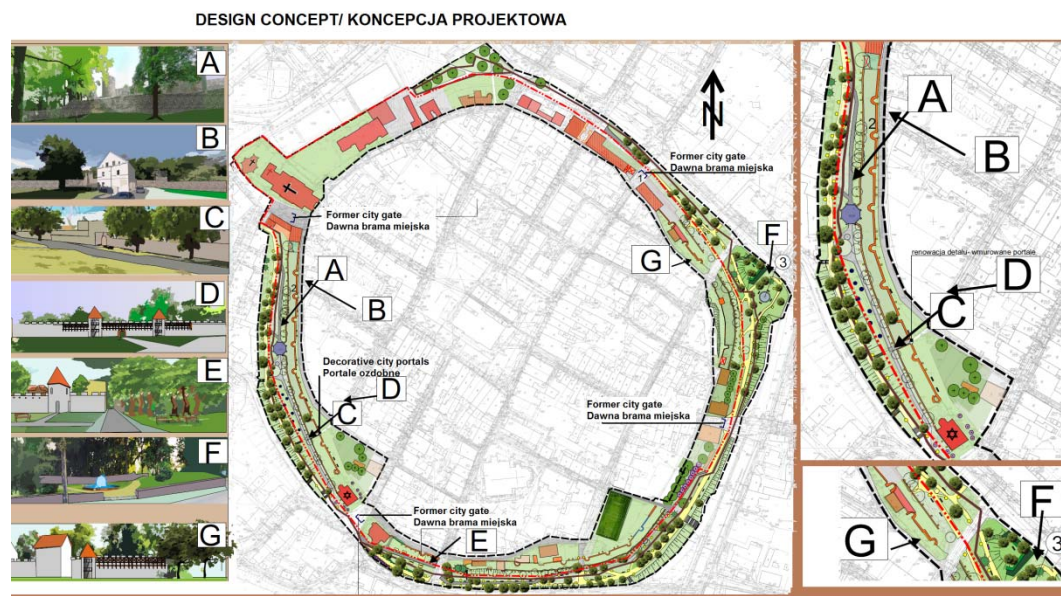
The final element of the plan: the concept of area arrangement, including city planted area. Source: own research
